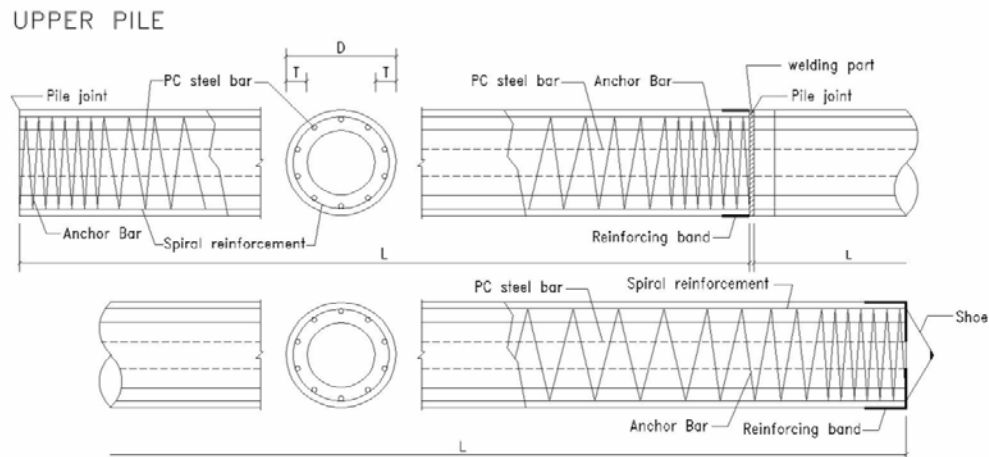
Details of Pile Shaft of a Precast Prestressed Spun Concrete Pile
